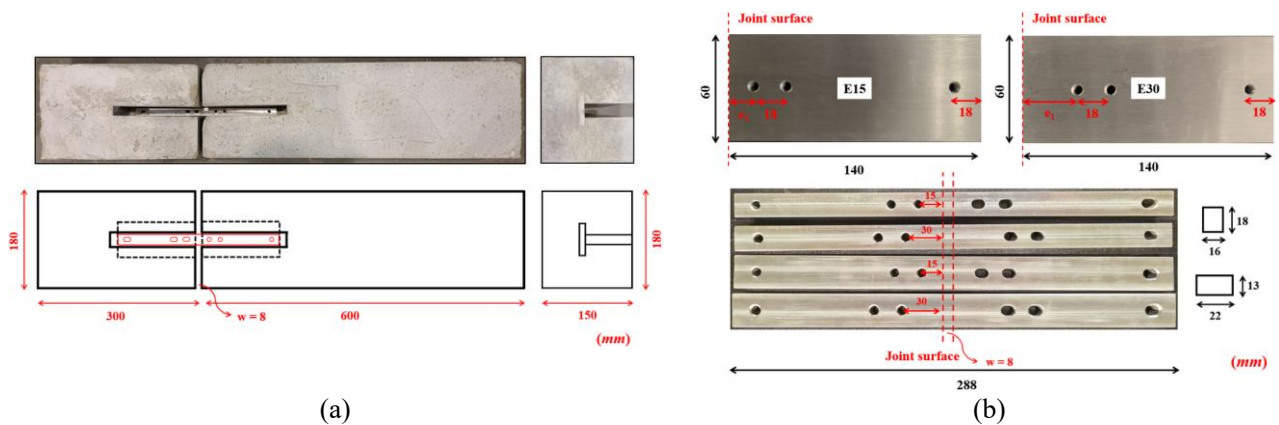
Demountable steel connection system (a) components, (b) test specimen.
